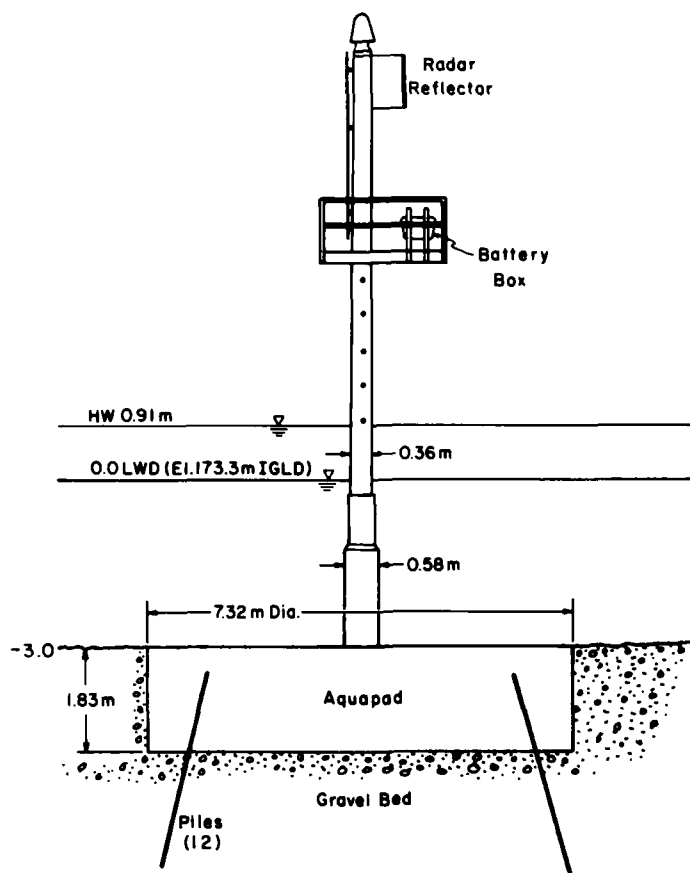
Steel light tower on Maumee Bay, Lake Erie. The tower has a square cross section.
